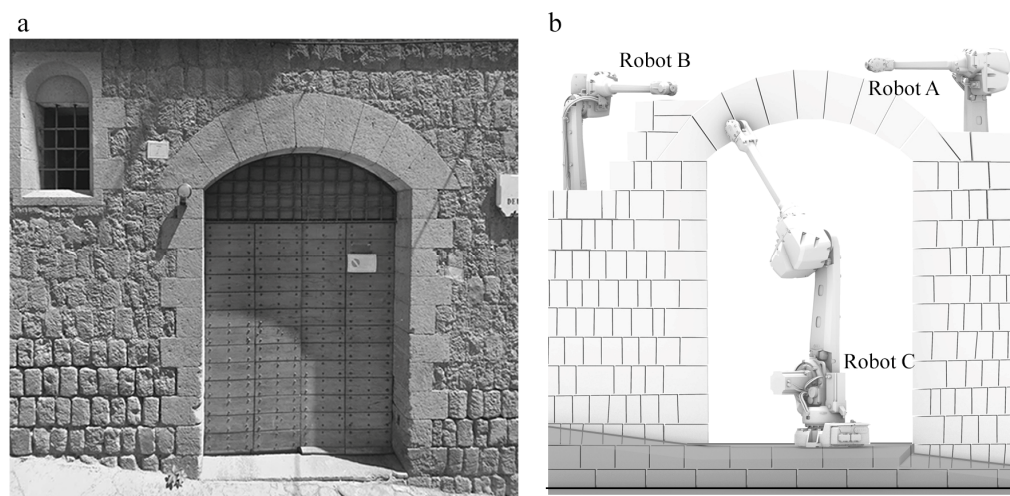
(a) Masonry arch (Viterbo, Italy). (b) Geometrical model of masonry arch construction analyzed. The structure rests on a horizontal foundation even though the street level is sloping, so all analyses were conducted considering a horizontal plane as the foundation (black line).
